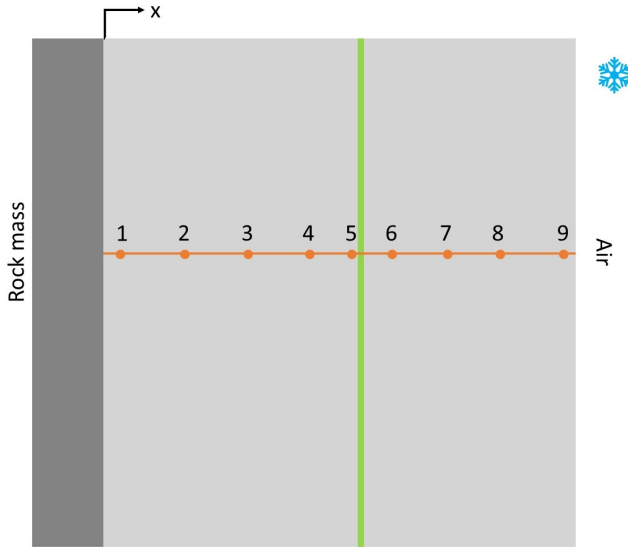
Detail enhanced from Figure 4.2. Measuring points in concrete, x in the direction towards the tunnel room.
